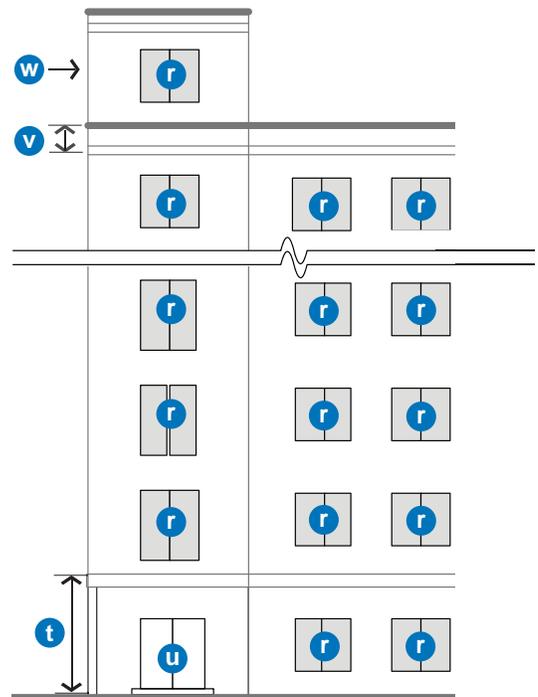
(3). General Stoop Building: Street Facade Requirements.
